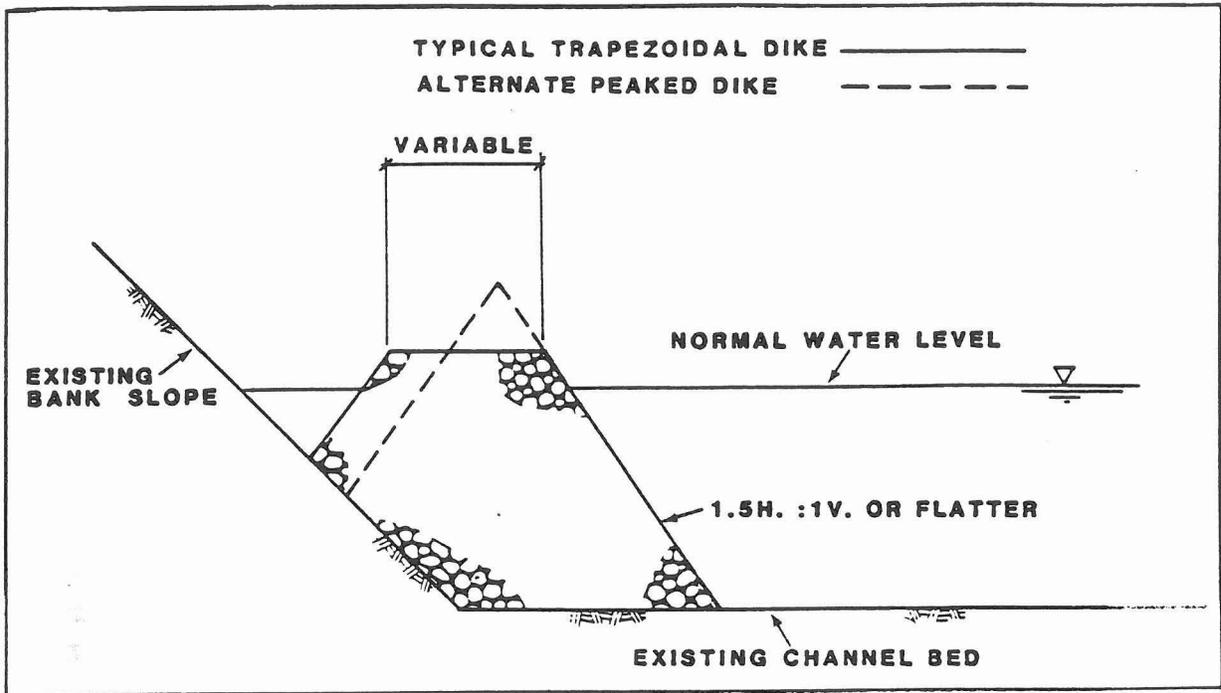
Typical longitudinal rock toe-dike geometries (After [37]).
